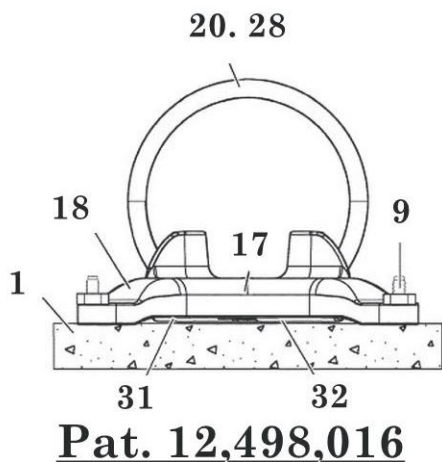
Side view of the hoist point anchor of figure 1, and of a ceiling to which the hoist point anchor is anchored through anchor bolts.
